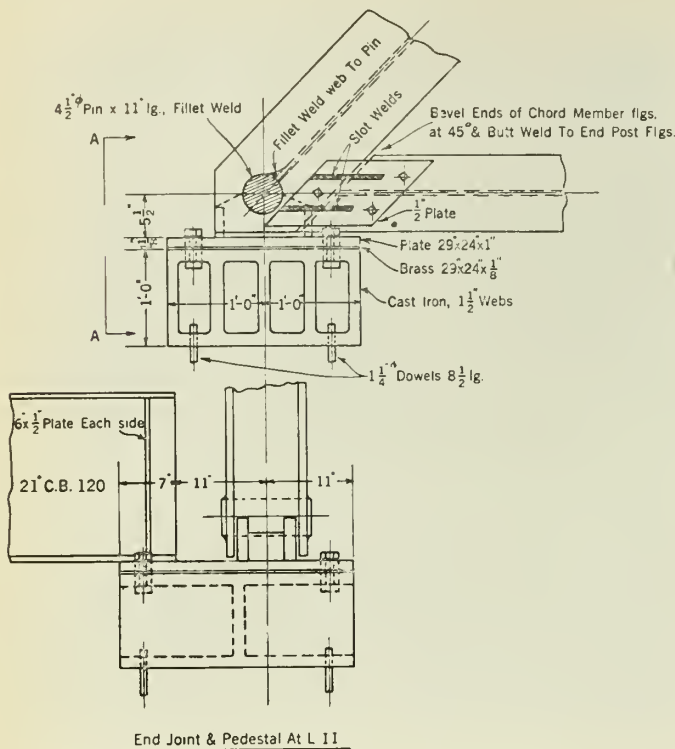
Detail of End Joint and Pedestal of Welded Bridge at Chicopee Falls.
